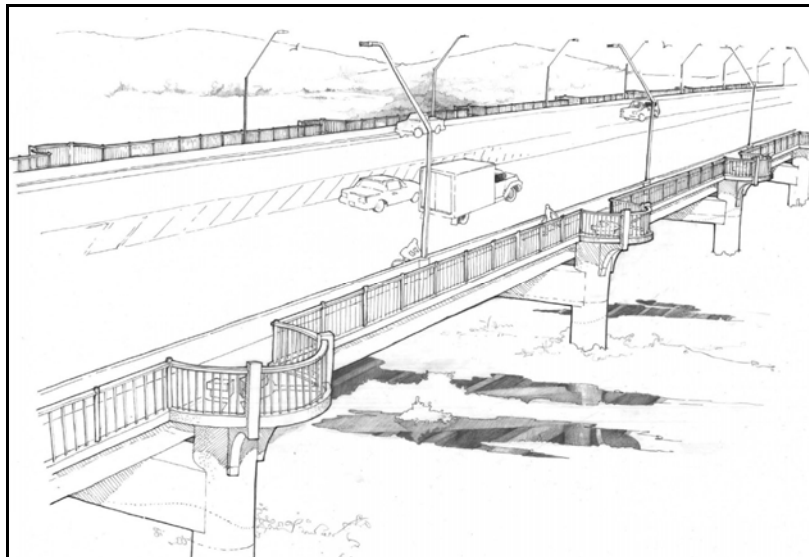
Preliminary Sketch of Bridge with Pedestrian Alcoves
